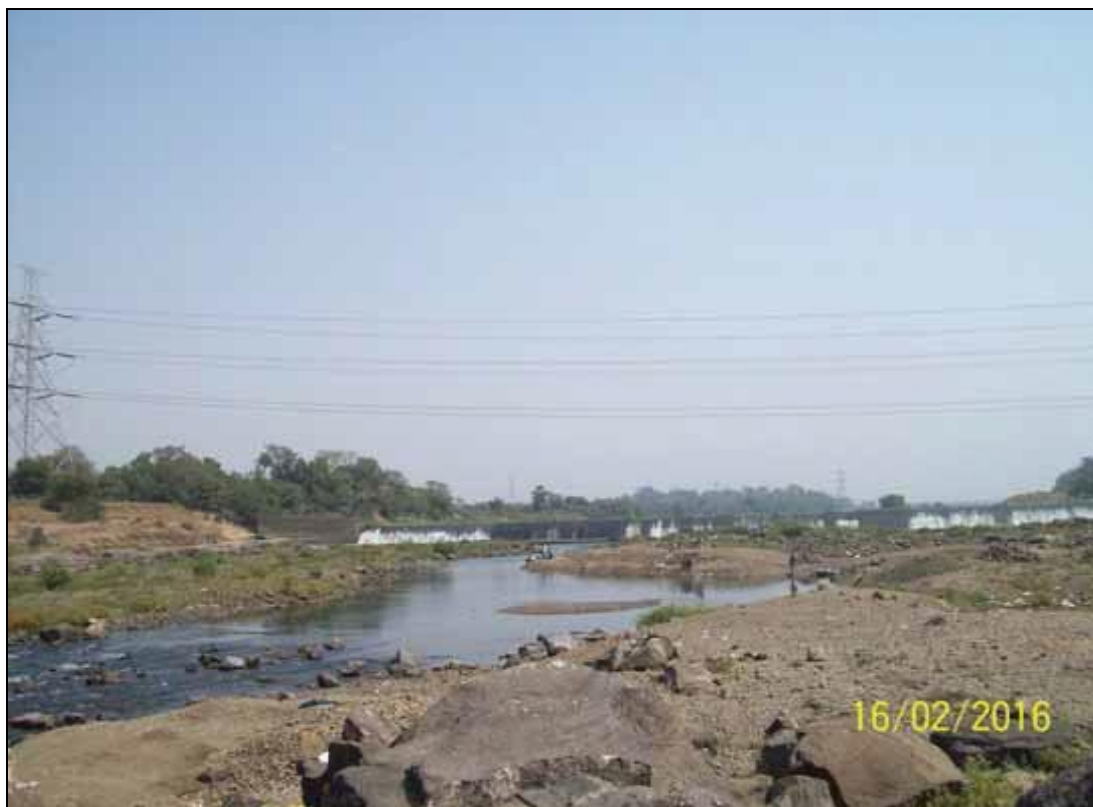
Badlapur Bridge from the centre of a second bridge 60 m downstream on the river at Ch 89.07km
